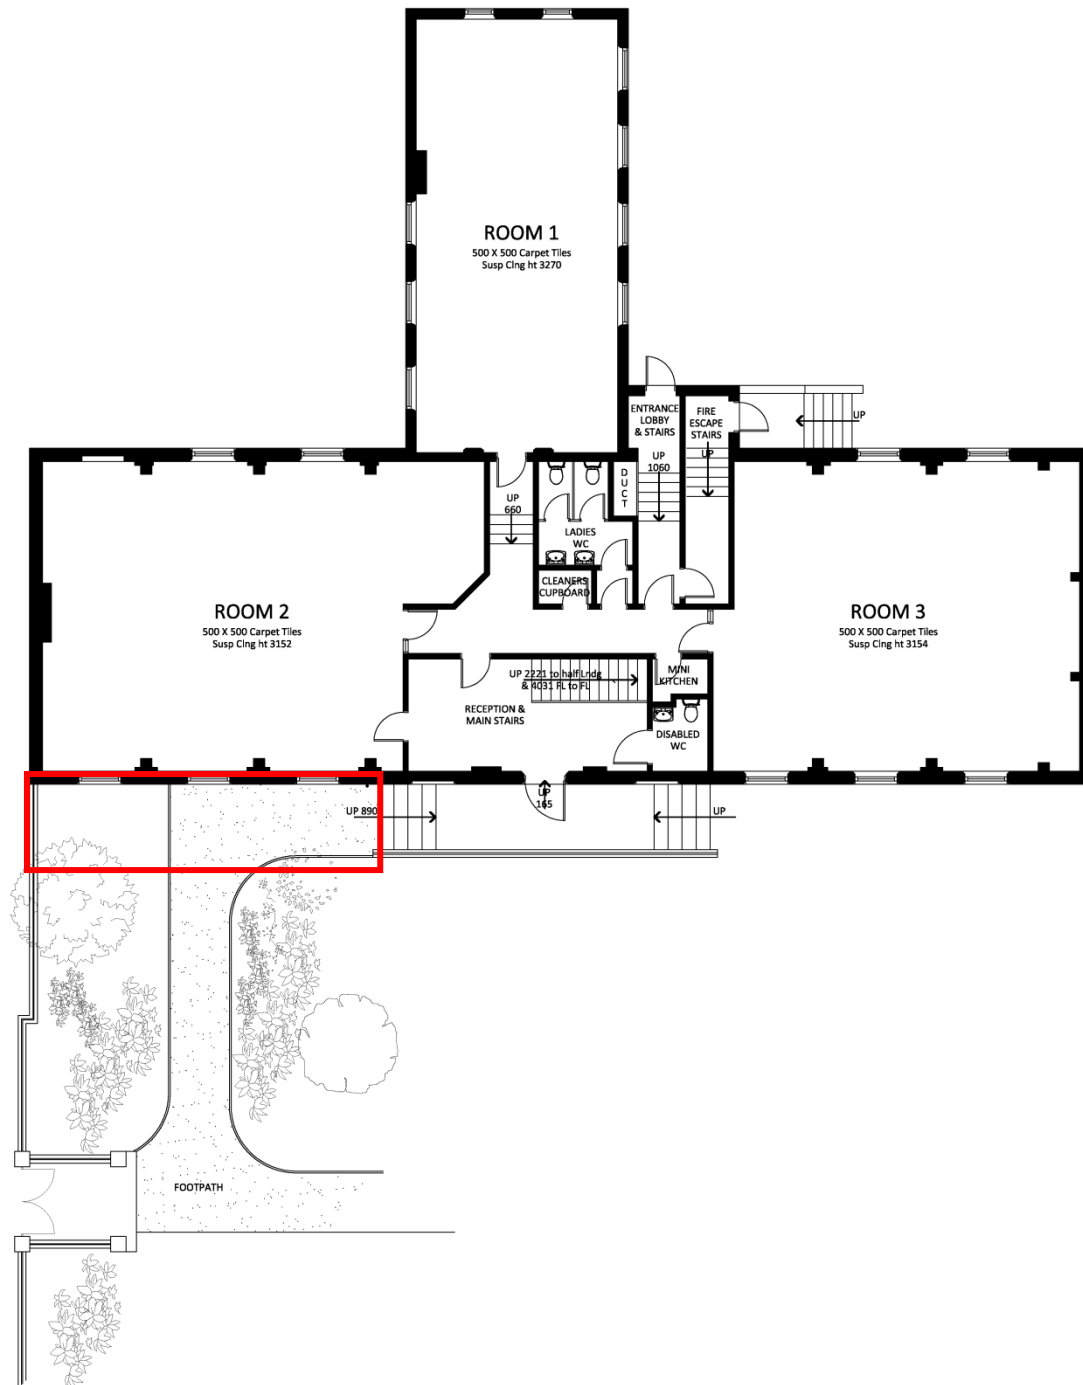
Site location plan, red shaded area denotes location of access ramp.
